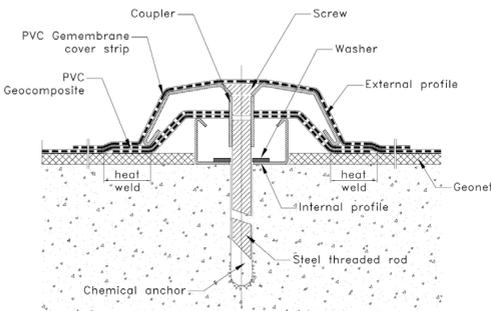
Cross section of the patented anchoring and tensioning system used for concrete dam rehabilitation.
